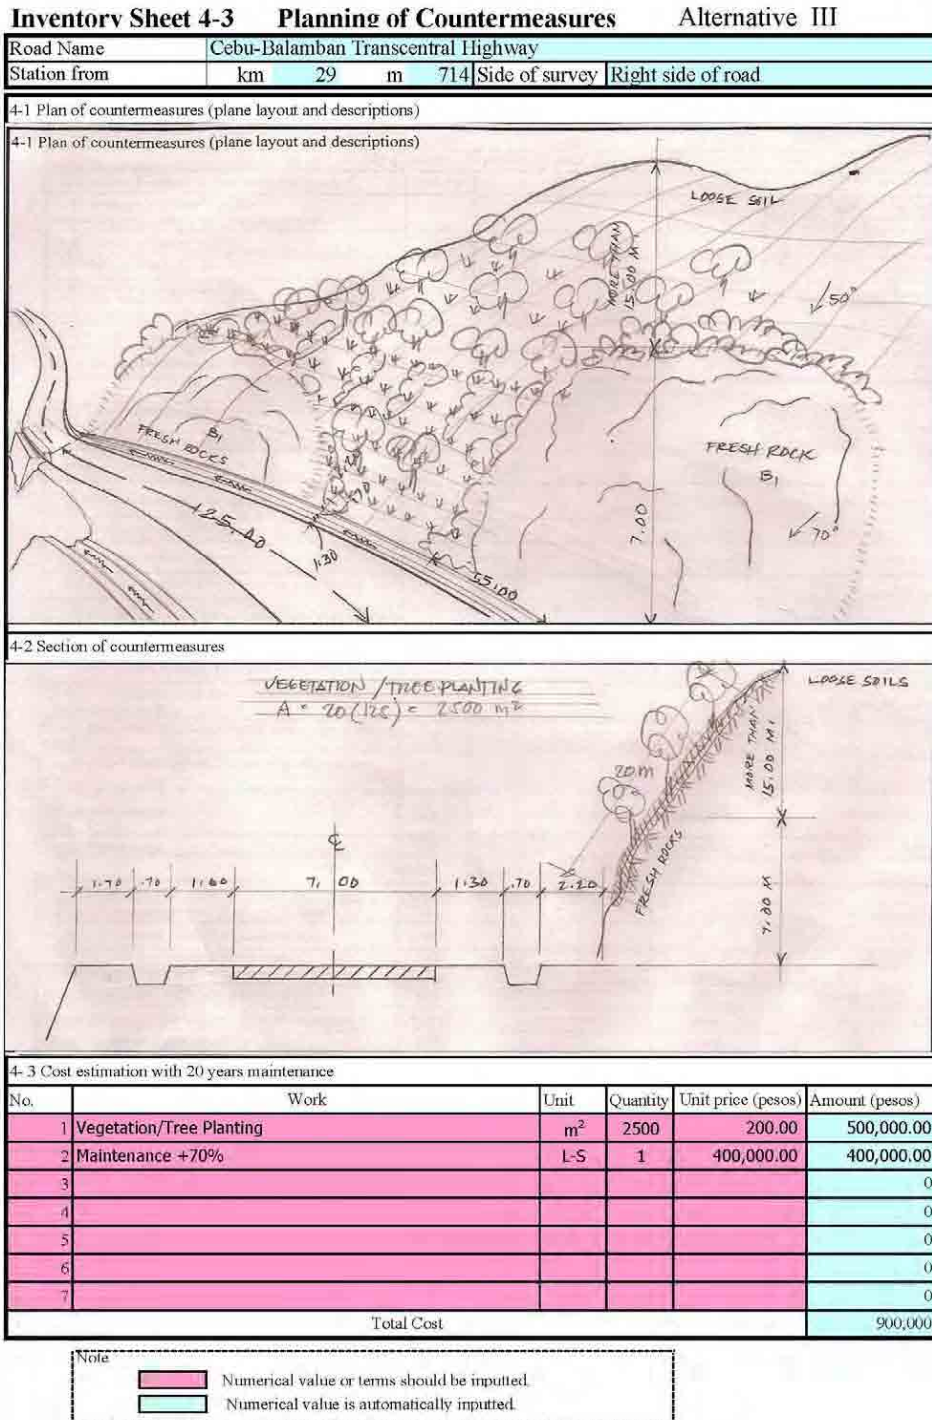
Example of Inventory Sheet 4-3: Planning of Countermeasure Alternative III for Soil Slope Collapse
